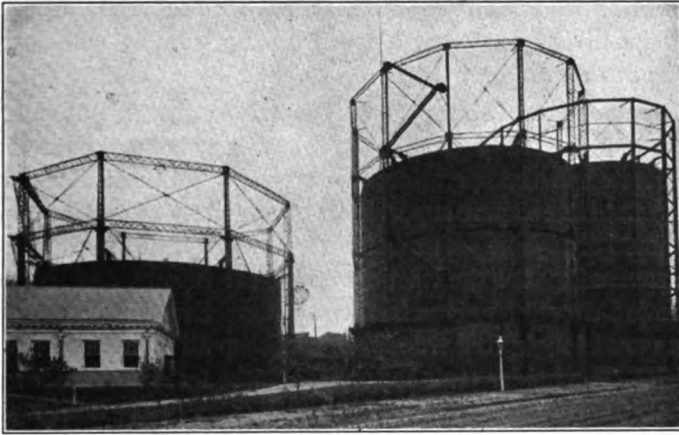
Three types of holder guide frames, 1870, 1902 and 1912-13.
